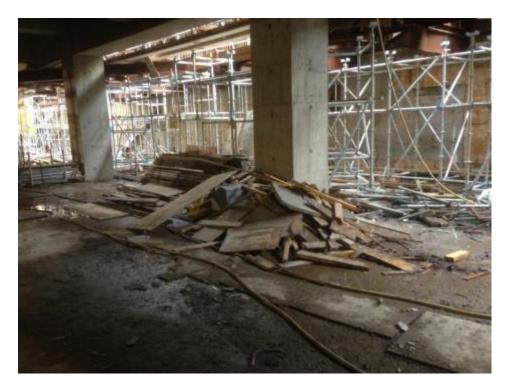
Timber Waste after Removal of Timber Formwork (1)
